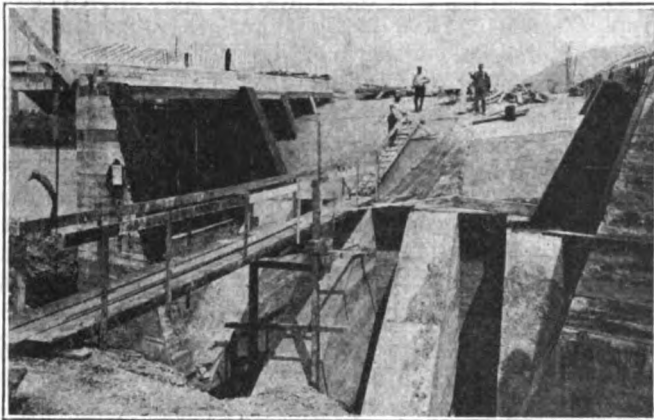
SOUTH ABUTMENT BUTTRESSES AND WATERPROOFING
